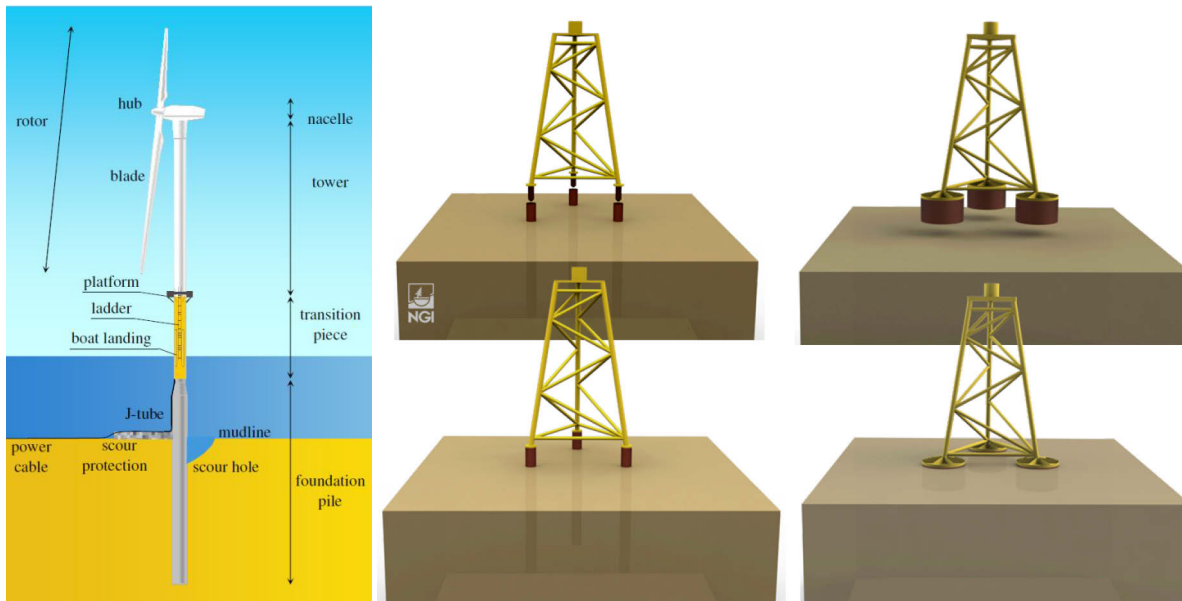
Definitions for Monopile foundation (left) and Tripod jackets with pre-driven piles or suction caissons (right)
